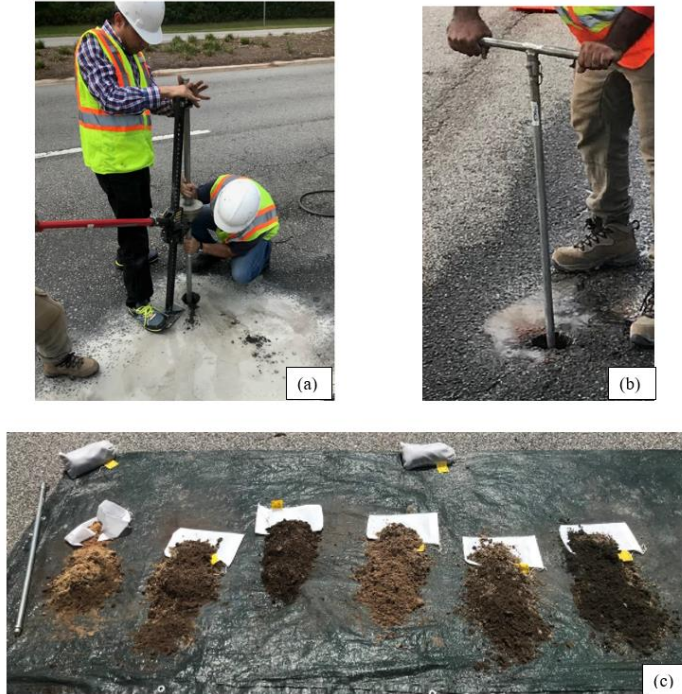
Subgrade Sample Collection Process: (a) Shelby Tube Sample Collected with Assistance from a Jeep Jack, (b) Bulk Sample Collected by Hand Auger, and (c) Bulk Samples
